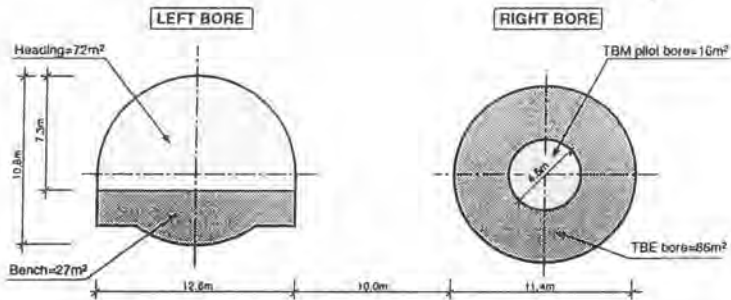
Cross section at Avise Tunnel showing the drill and blast excavation (Left Bore) and TBE (Right Bore).
